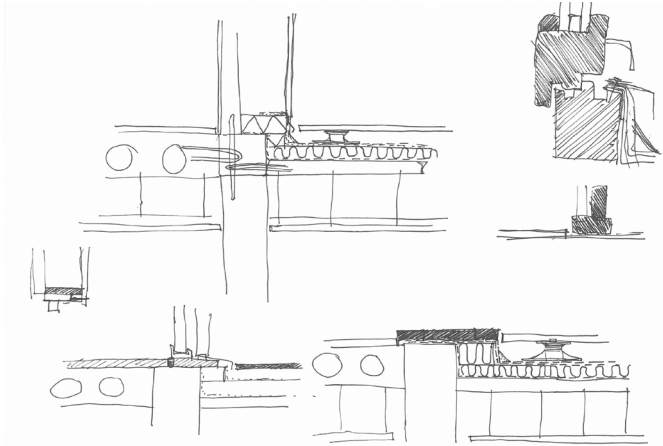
Sketches: Terrace wall and slabs connection, placing of door step and height of the elephant feet
